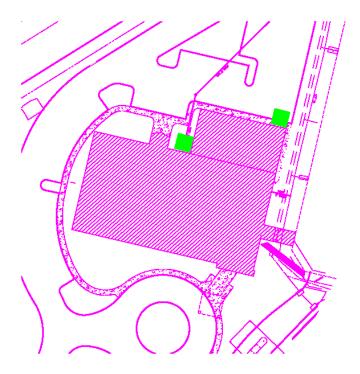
Proposed Locations for Mechanical Equipment Housing
